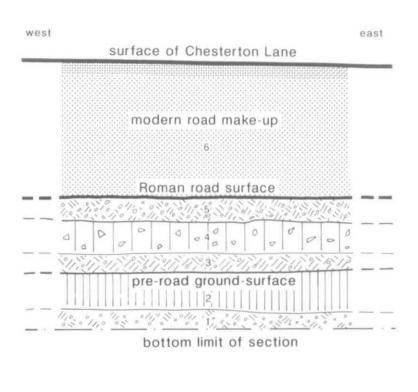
Lengthwise section through Akeman Street Roman road beneath Chesterton Lane. This section was recorded in the centre of the W. bridge abutment of the Chesterton Lane overbridge. Layer 1 – natural, gravelly brown clay subsoil; 2 – darker pre-road ground surface; 3 – redeposited natural subsoil; 4 – small, broken subangular limestone and soil; 5 – redeposited natural subsoil with two pottery sherds; 6 – Chesterton Lane, the modern road bed of limestone and clay capped with tarmac.
